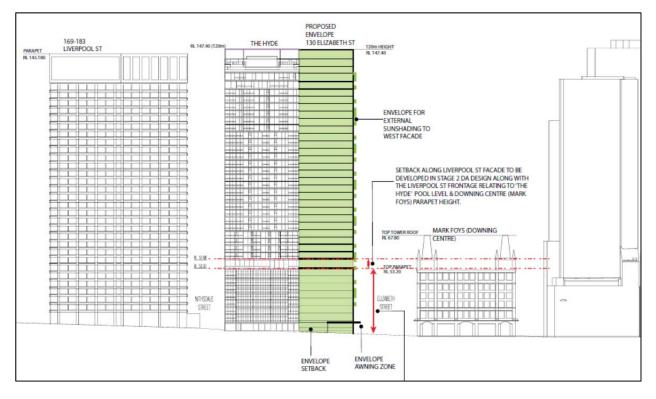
The northern elevation of the proposed building envelope, as viewed from Liverpool Street
